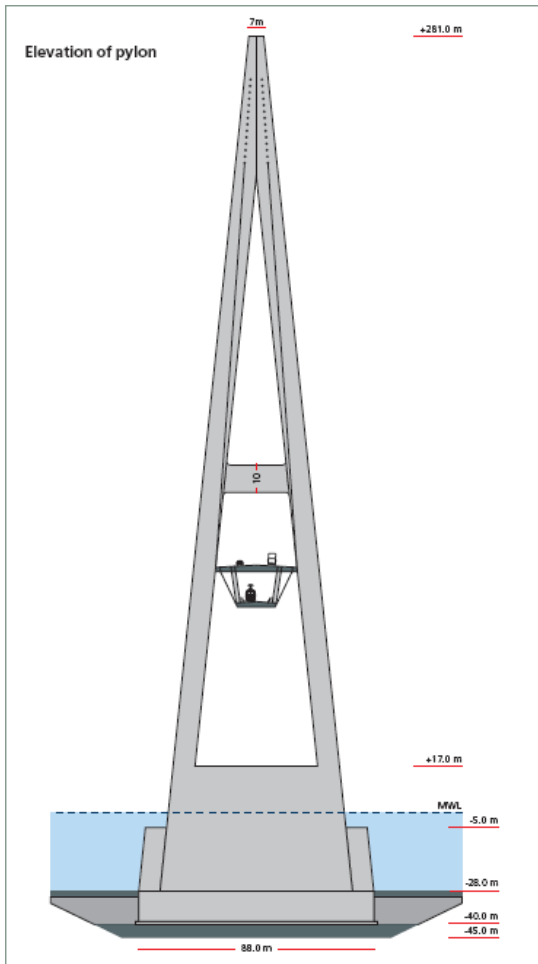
The cross section of the pylon of the cable-stayed bridge [www2008].
